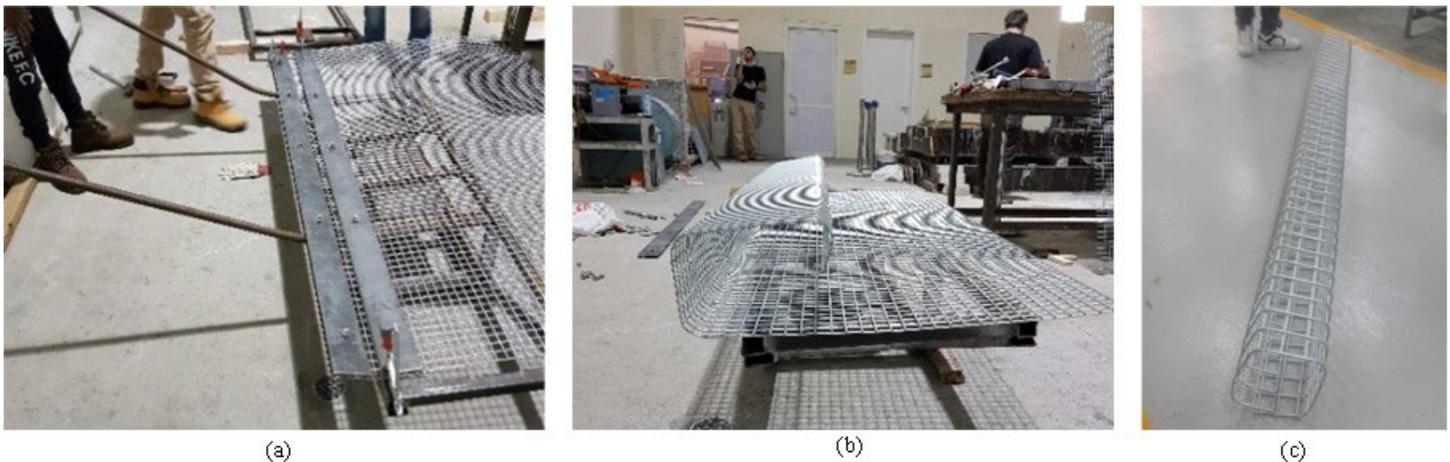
Proposed use of WWR in concrete beams, (a) WWR setup for bending, (b) bending of the sheet, and (c) final product.
